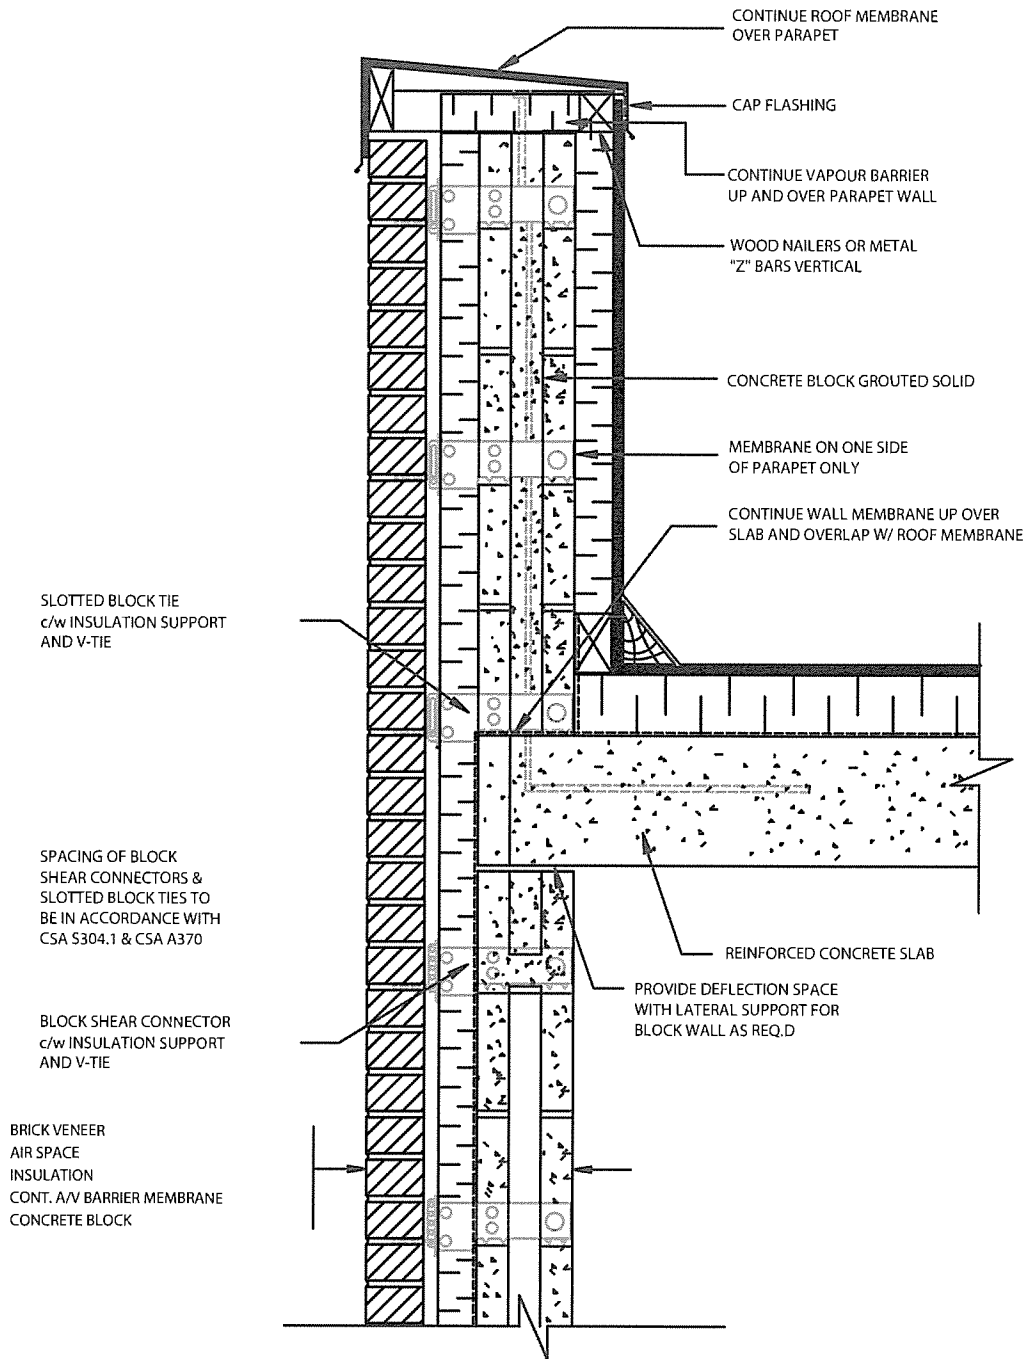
BRICK VENEER/CONCRETE BLOCK-DETAIL AT HIGH PARAPET
